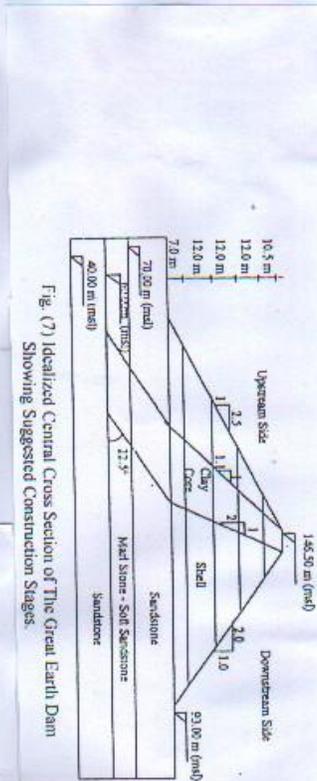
Idealized Central Cross Section of The Great Earth Dam Showing Suggested Construction Stages.
